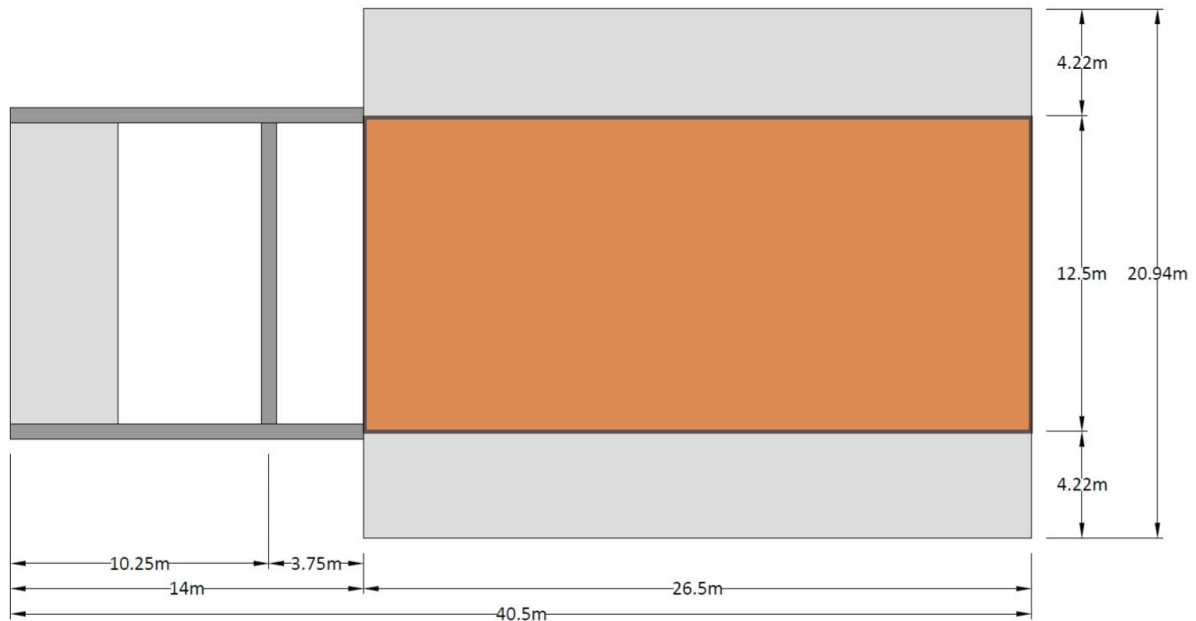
LM4 - centre span; load placement for cross girders at centre span
